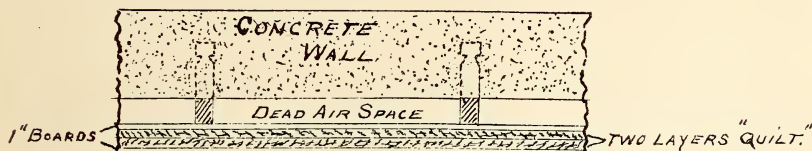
Detail construction of wall of Triangle Orchard Company's apple storage house.
